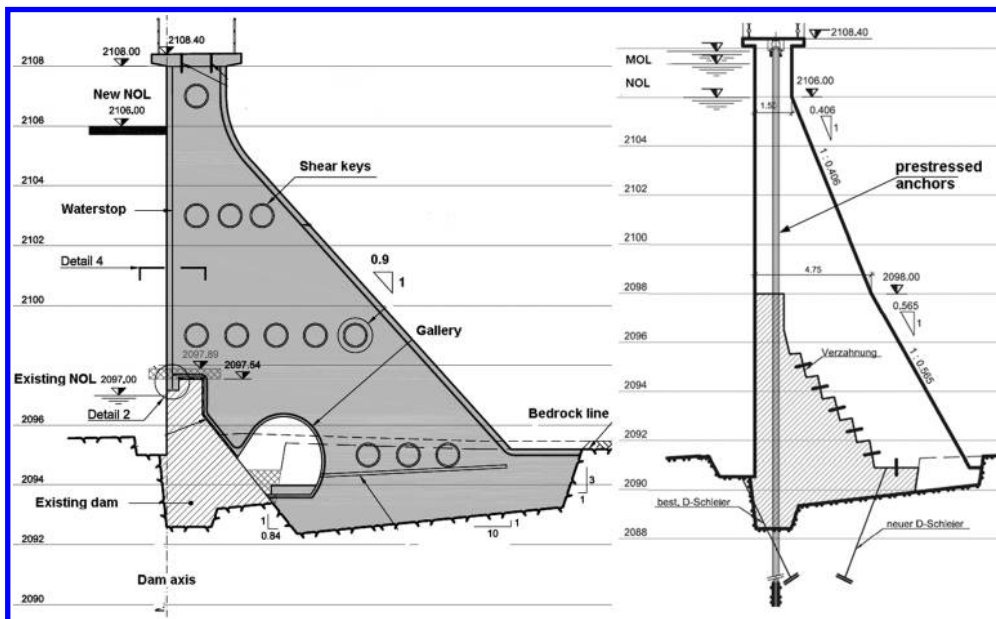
Left: typical cross section of the downstream gravity dam heightening. Right: typical cross section of the heightening using prestressed anchors. (Not to scale).
